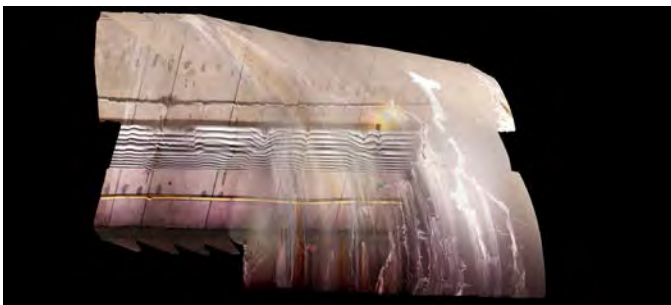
Eisenhower Memorial Tunnel: Clean air supply duct, south-west ventilation building.
